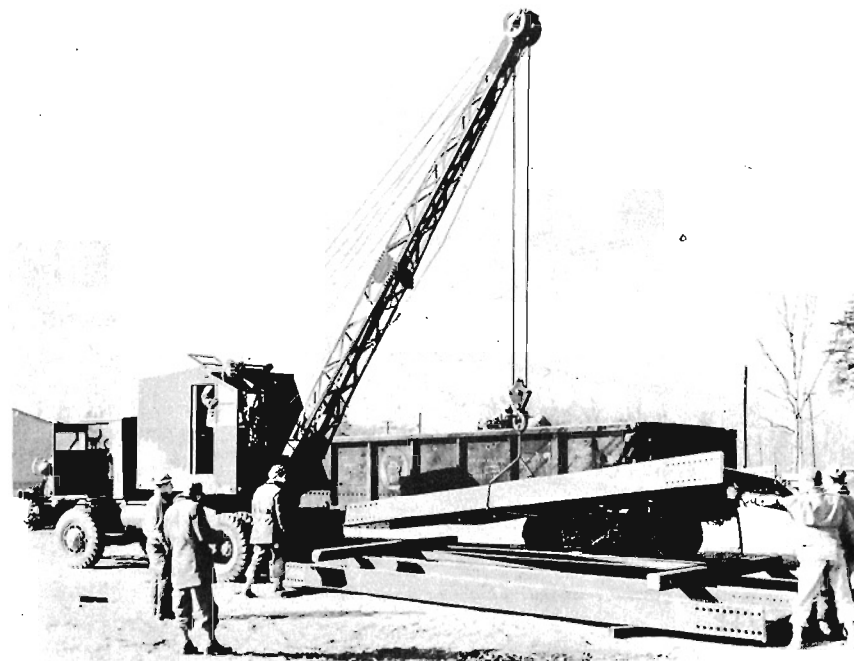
Unloading stringer sections from a gondola car with a $\frac{3}{8}$ -cubic-yard truck-crane. The timber dunnage keeps the steel off the ground and facilitates placing wire-rope slings. Sections shown are for a 60-foot-span semipermanent highway steel bridge.
